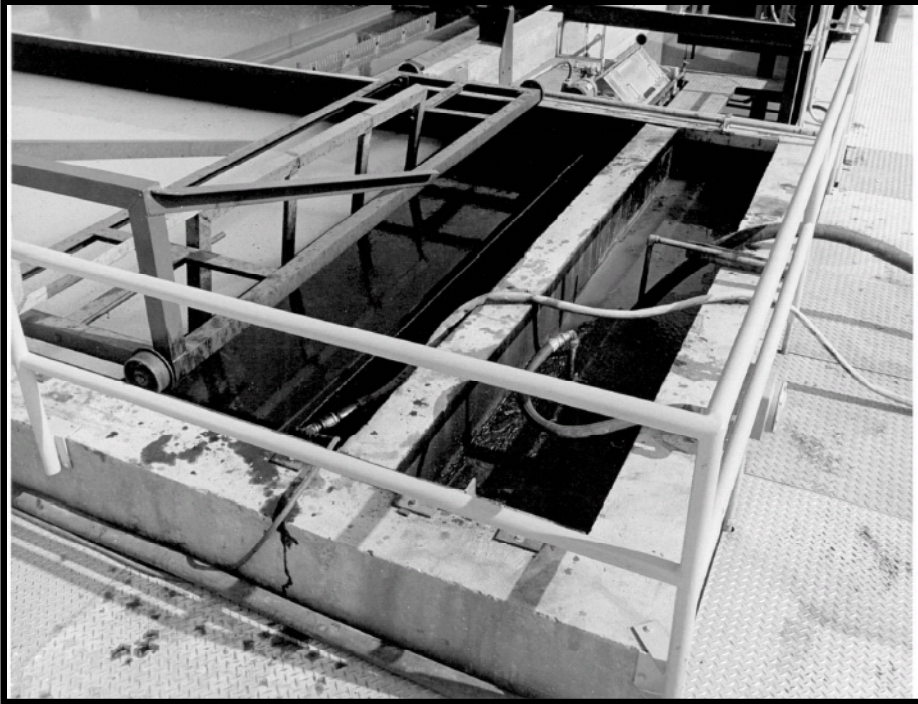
Undated photo. View looking north from WWTP roof at new Microscreen installation. Pipe trench is present along east side of tanks and is partially covered and north settling basin is full.
